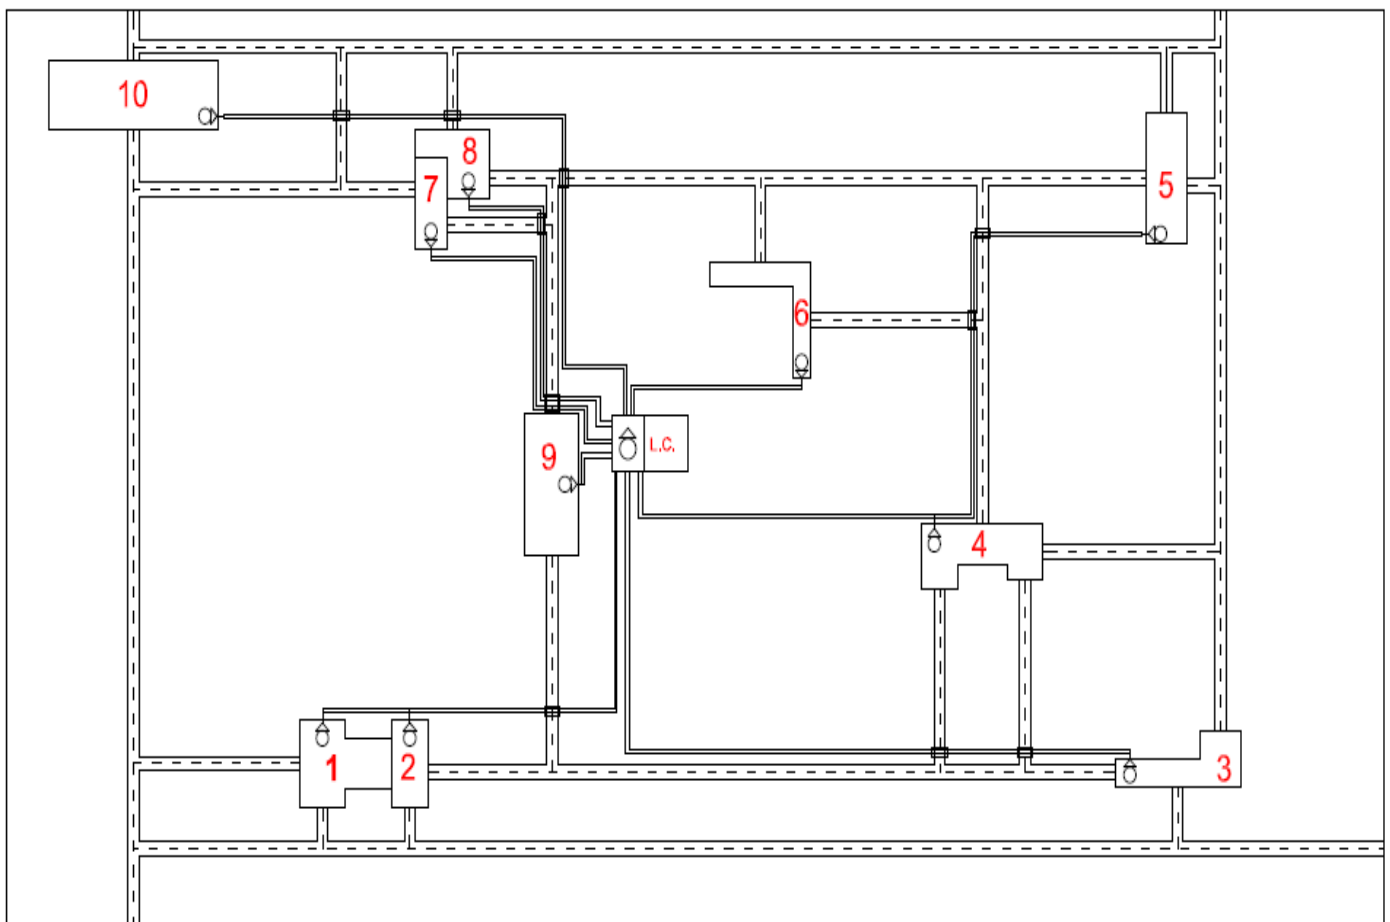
Plan of placing on locality of workshop and load center (LC)
